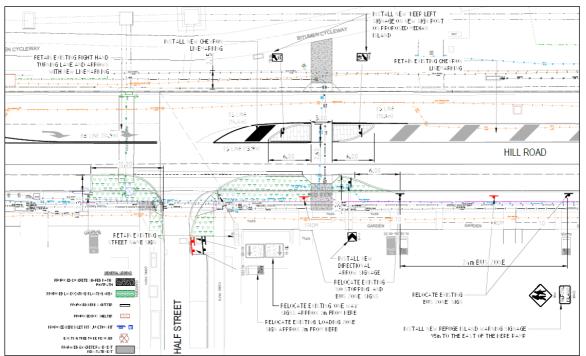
A concept plan of a proposed pedestrian refuge island in Hill Road, Wentworth Point immediately north of Half Street
